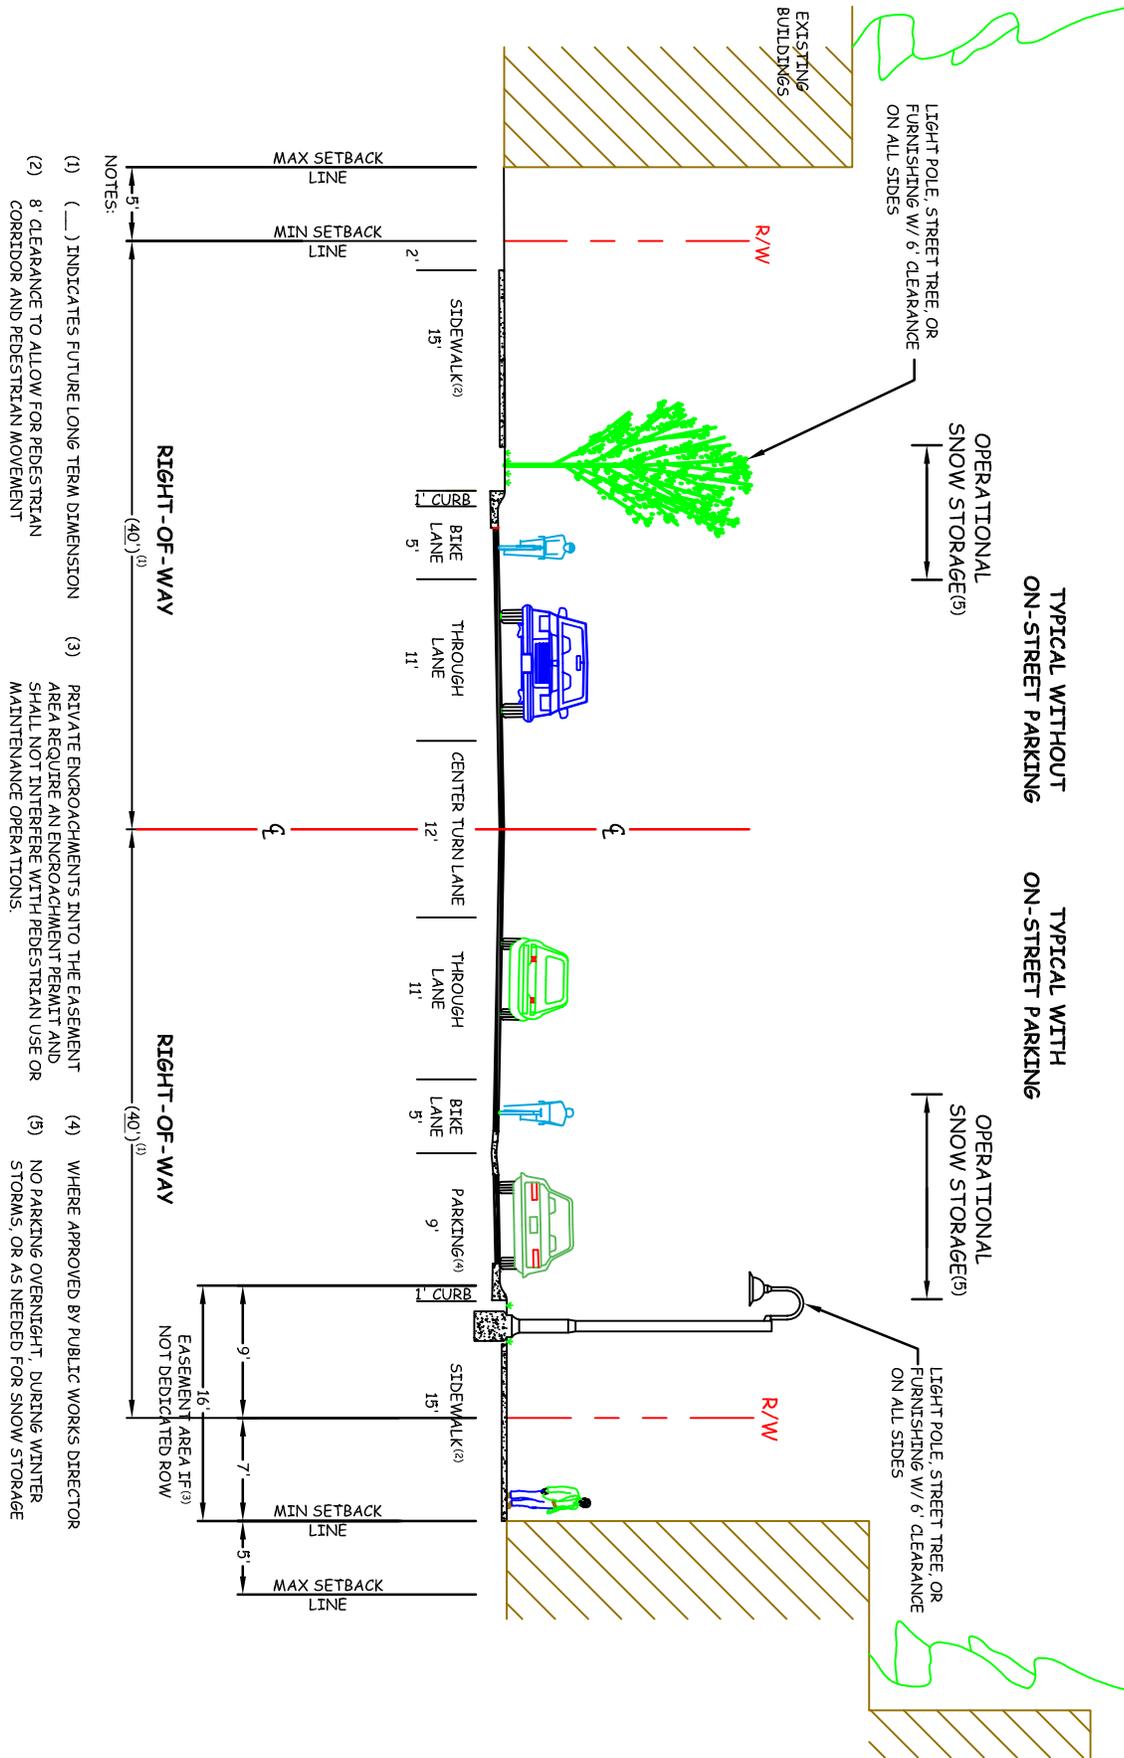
Typical Main Street Cross Section, East of Old Mammoth Road
